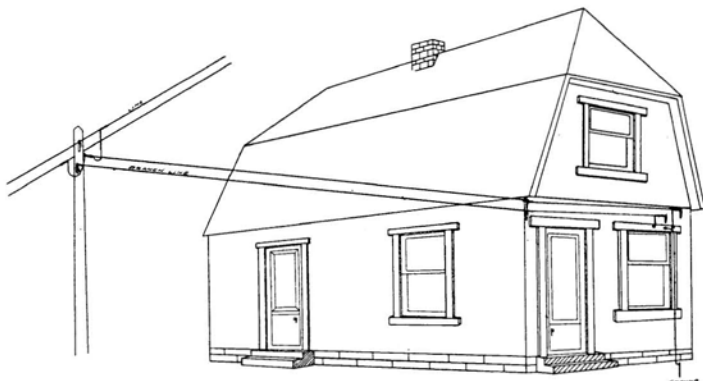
View Showing How the Drop Wires, when Run Along the Outside of a House, are Supported on Insulators.
